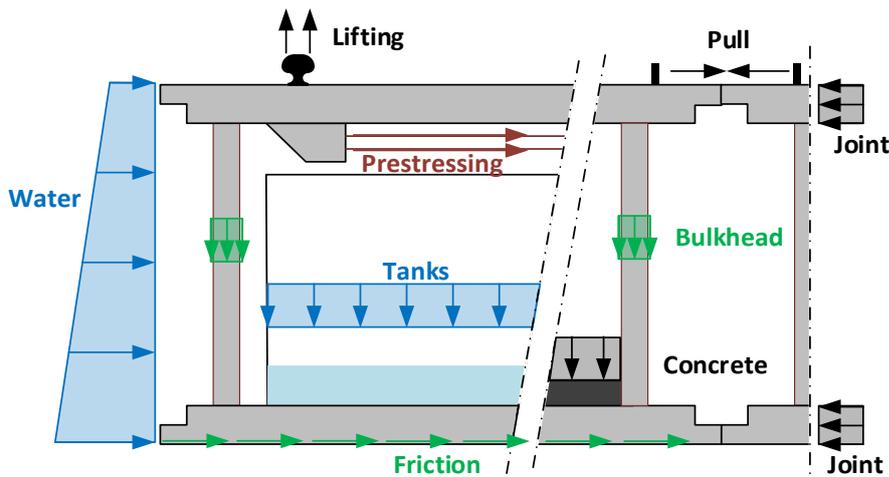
, LONGITUDINAL VIEW INCLUDING FORCES
